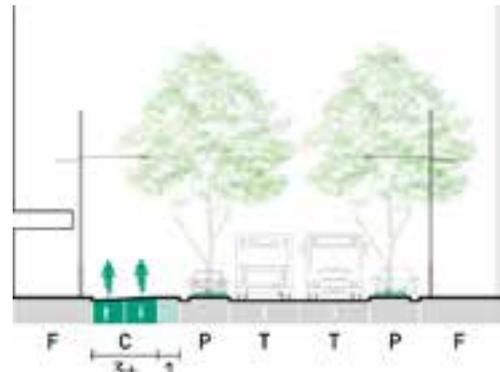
Typical cross section - optimal configuration (unconstrained)
